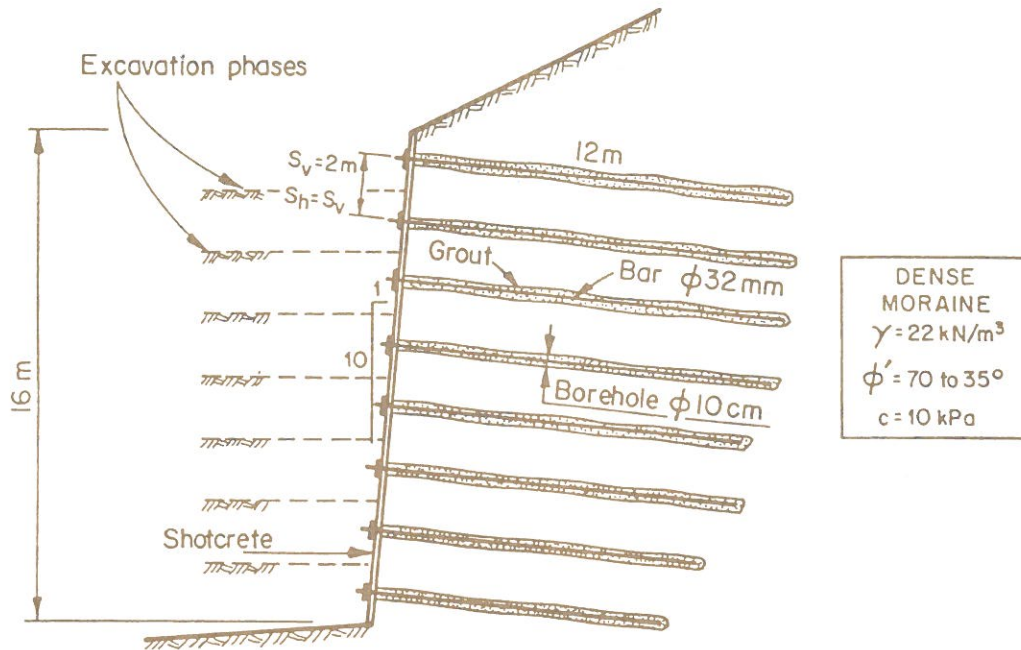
Soil nailed wall (La Clusaz, 1981) Grouted nails
